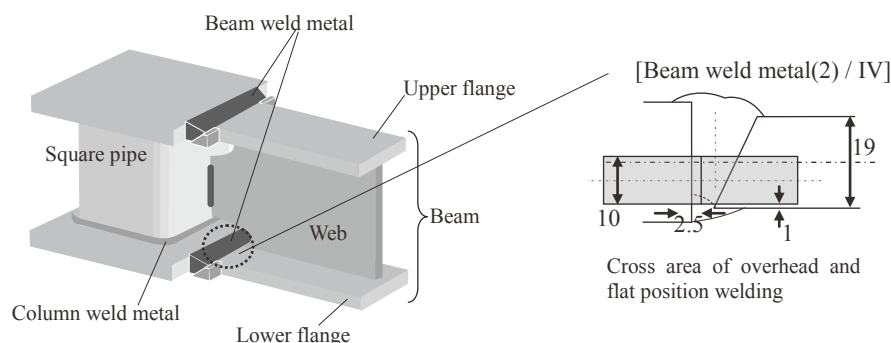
Position of mechanical test piece about mixture area of the overhead weld and the flat weld
